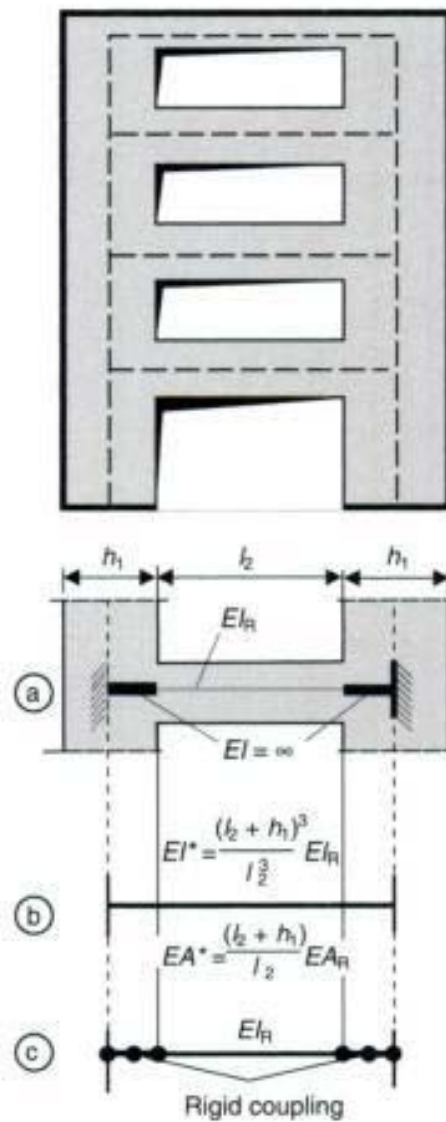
Models for the beam/column junction of a shear wall with large openings
